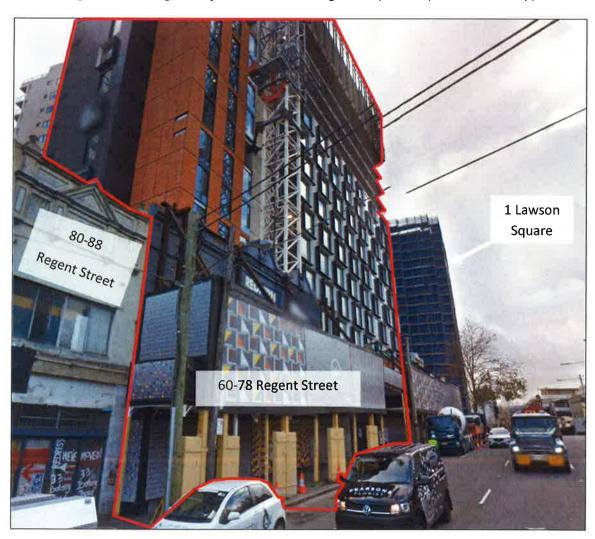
The site (shown in red) as viewed looking north on Regent street (source: Nearmaps)
